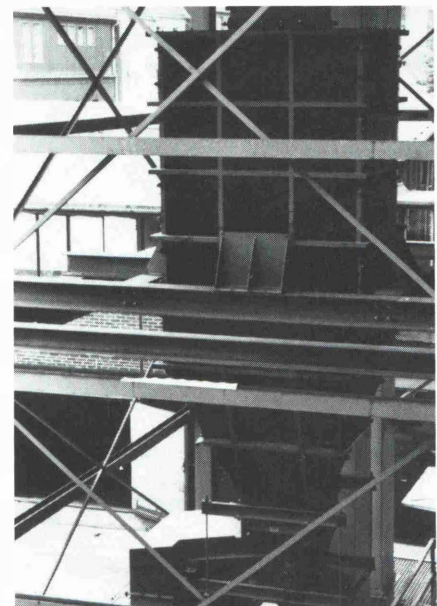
Flexilo* (steel-frame hopper with open framework and rubber walls): outlet portion
